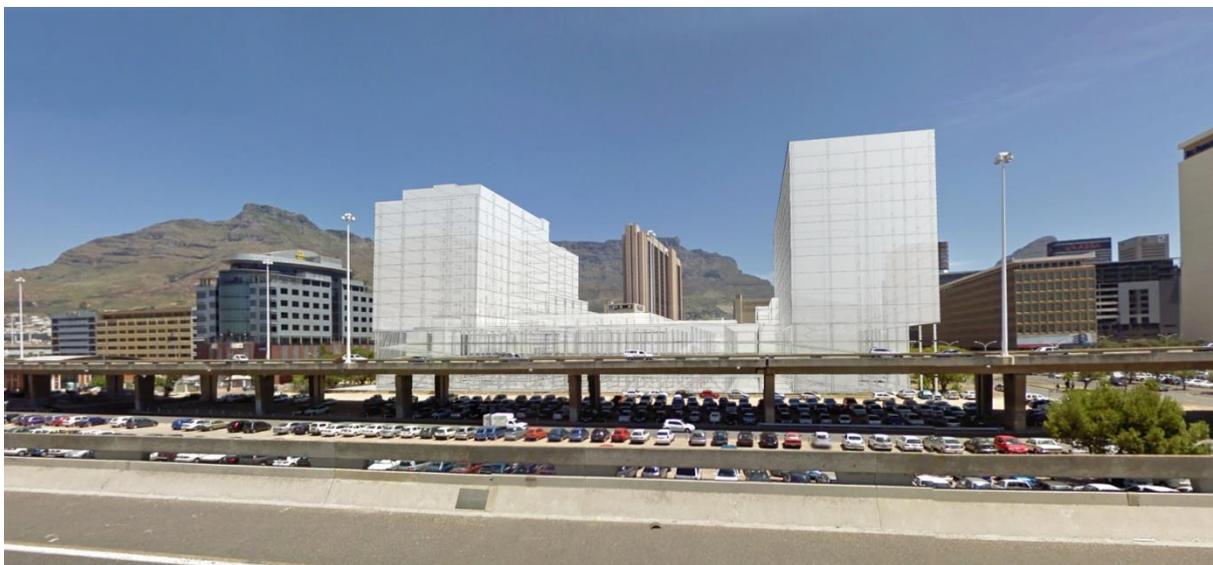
View 4A: PROPOSED VIEW FROM NELSON MANDELA BOULEVARD TRAVELLING EAST, LOOKING DIRECTLY TOWARDS THE SITE
